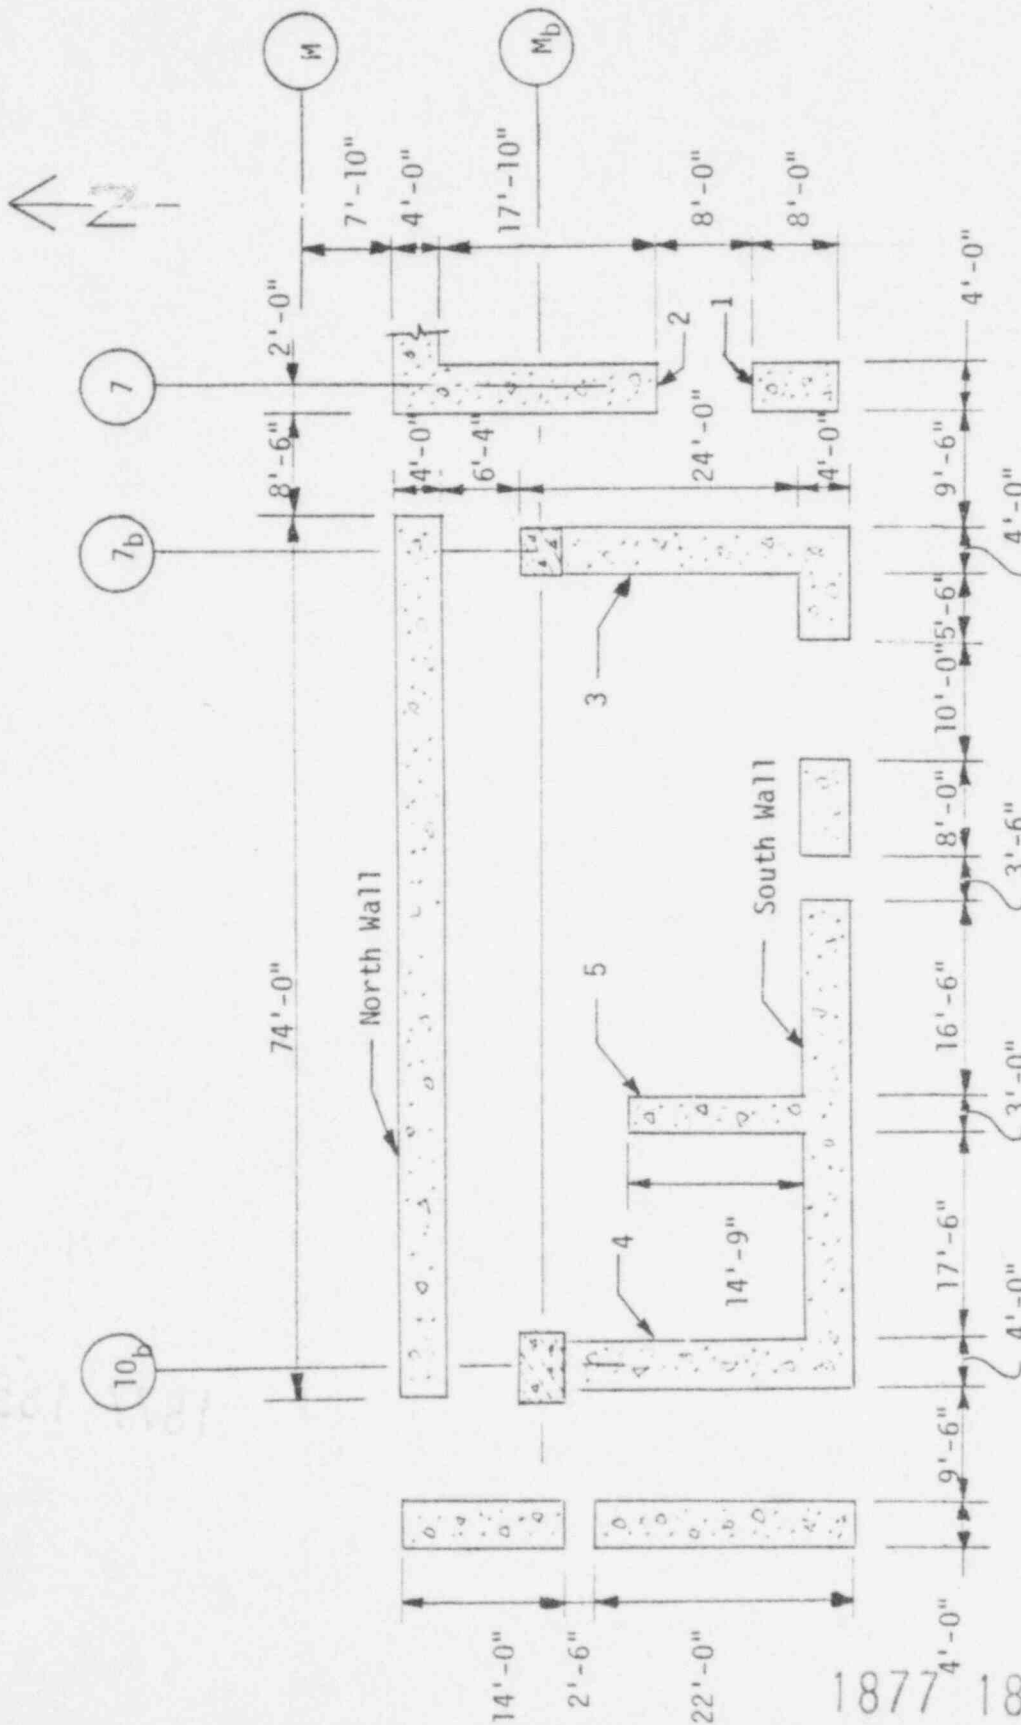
PLAN OF SPENT FUEL POOL AREA AT ELEVATION 693 FT. (REF. 6,11)
